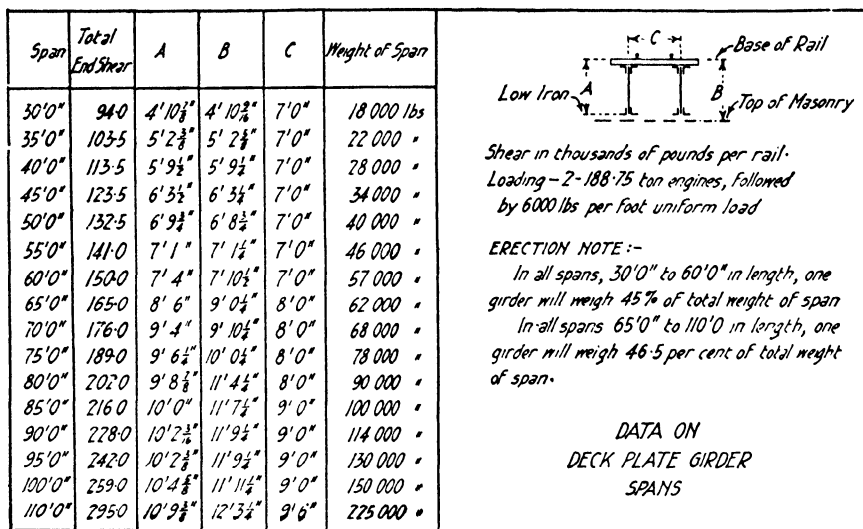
WEIGHTS OF DECK PLATE GIRDER SPANS.
